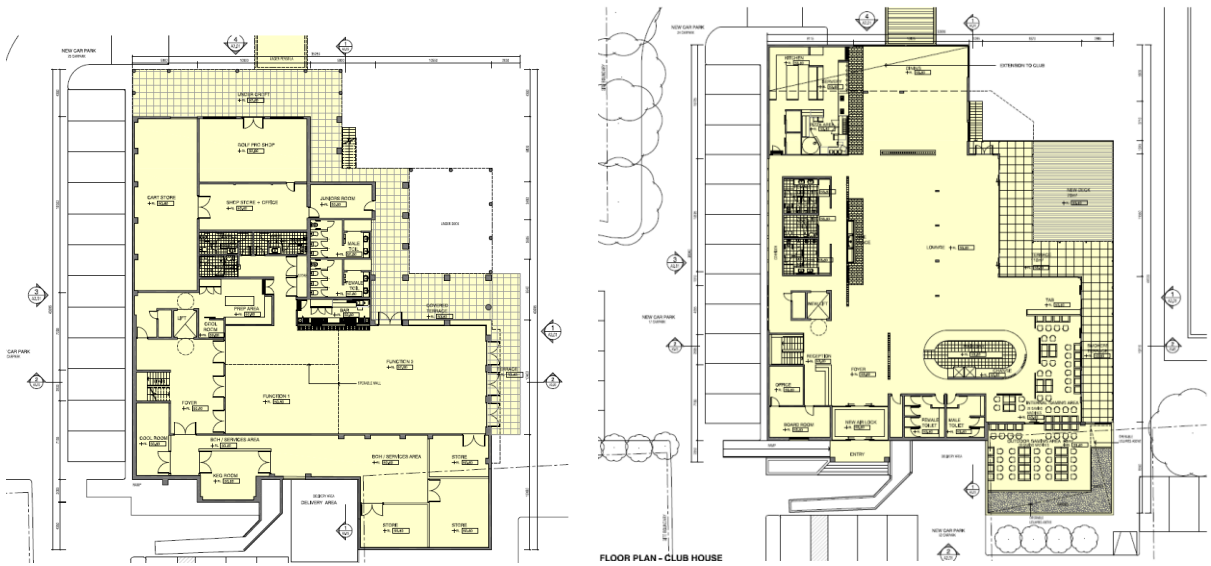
Proposed buildings: Wallacia Country Club (proposed work lower ground and ground levels)
